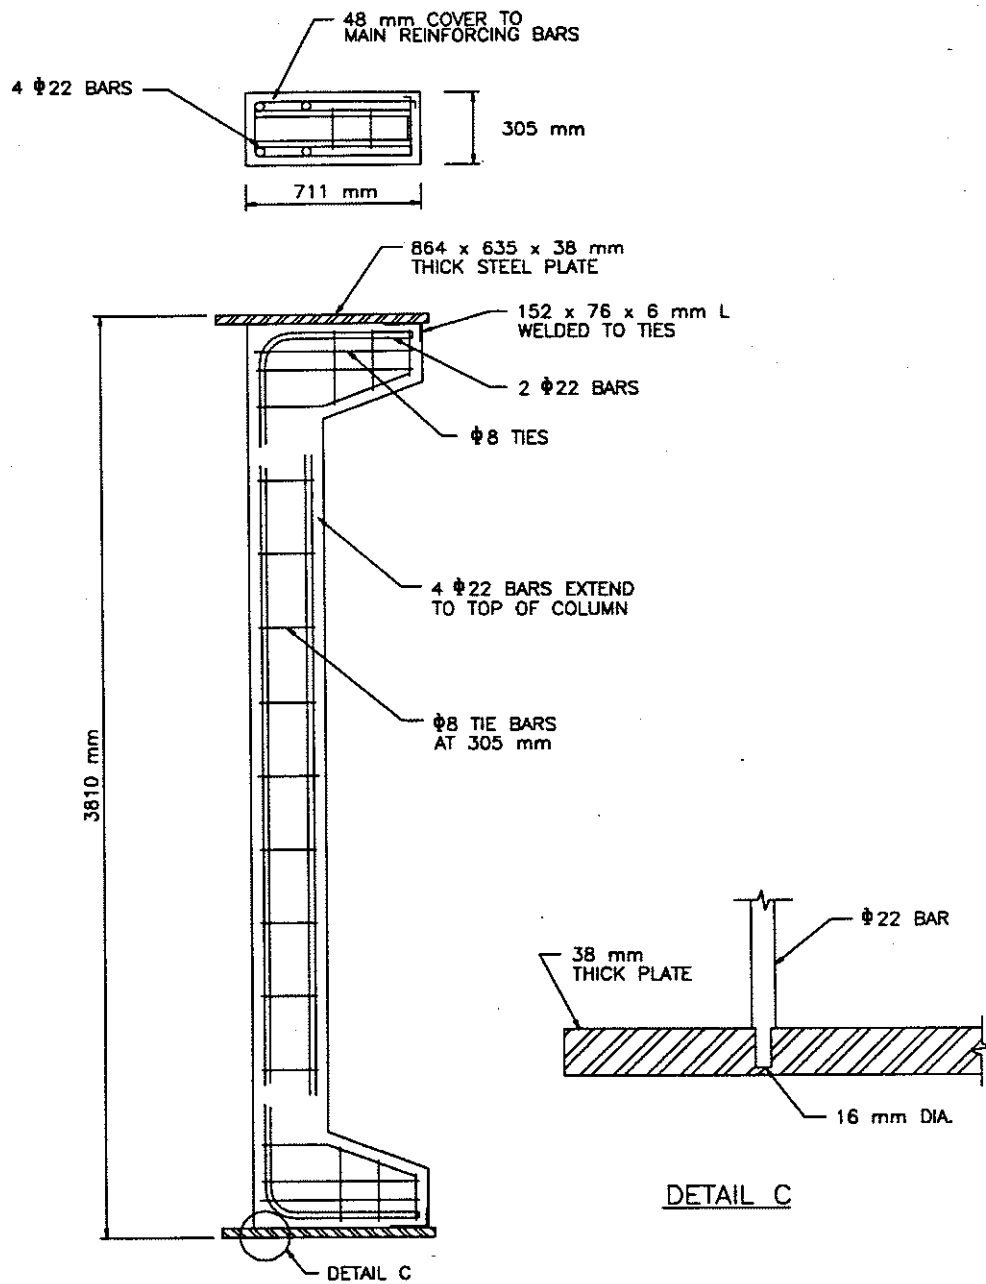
Elevation, Cross-Section and Finishing Detail: Column 7
